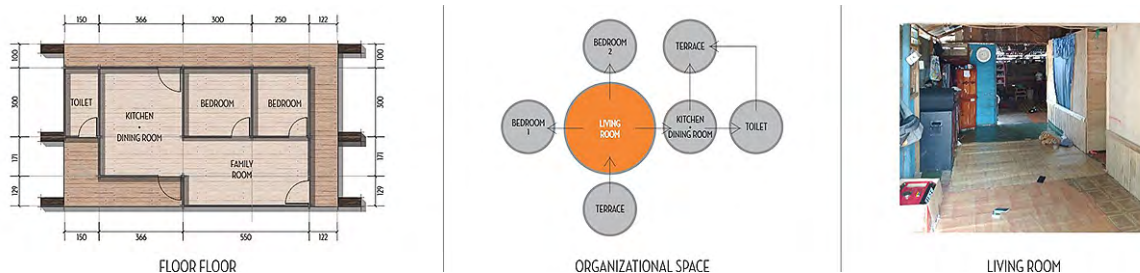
(a) Floor plan case 1; (b) Organizational space case 1; (c) Living room case 1
